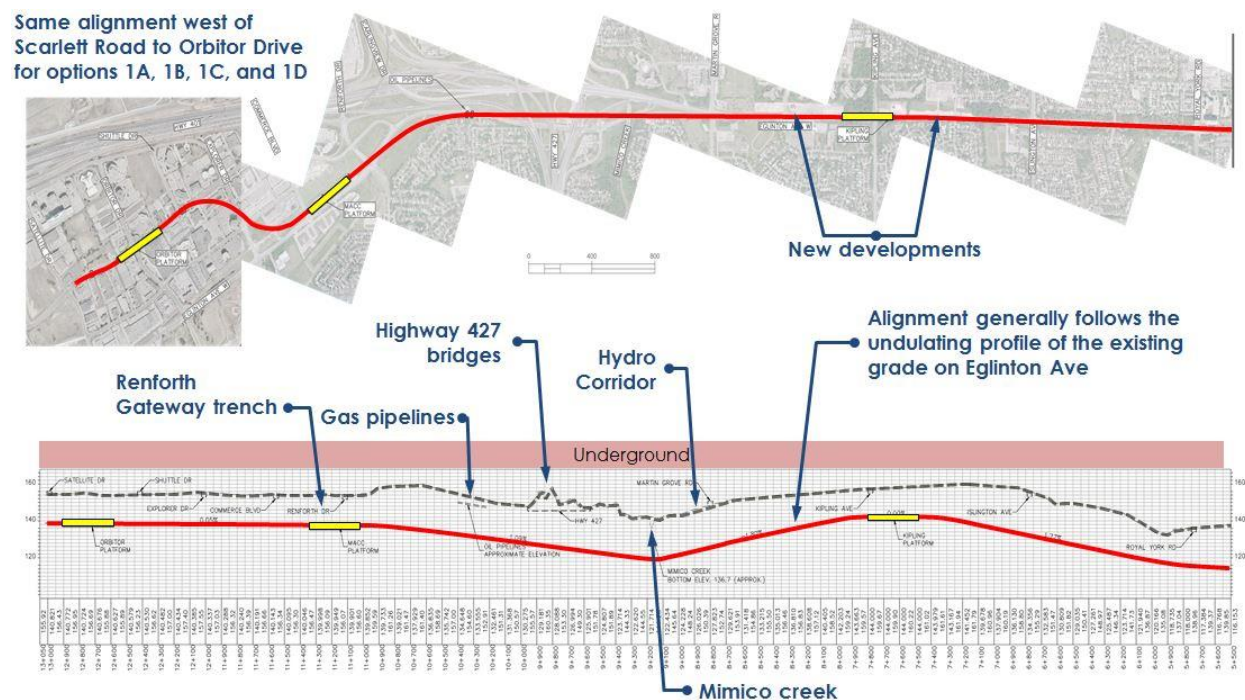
Plan and Profile for all Eglinton Alignments (Scarlett Road – Orbitor Drive)
